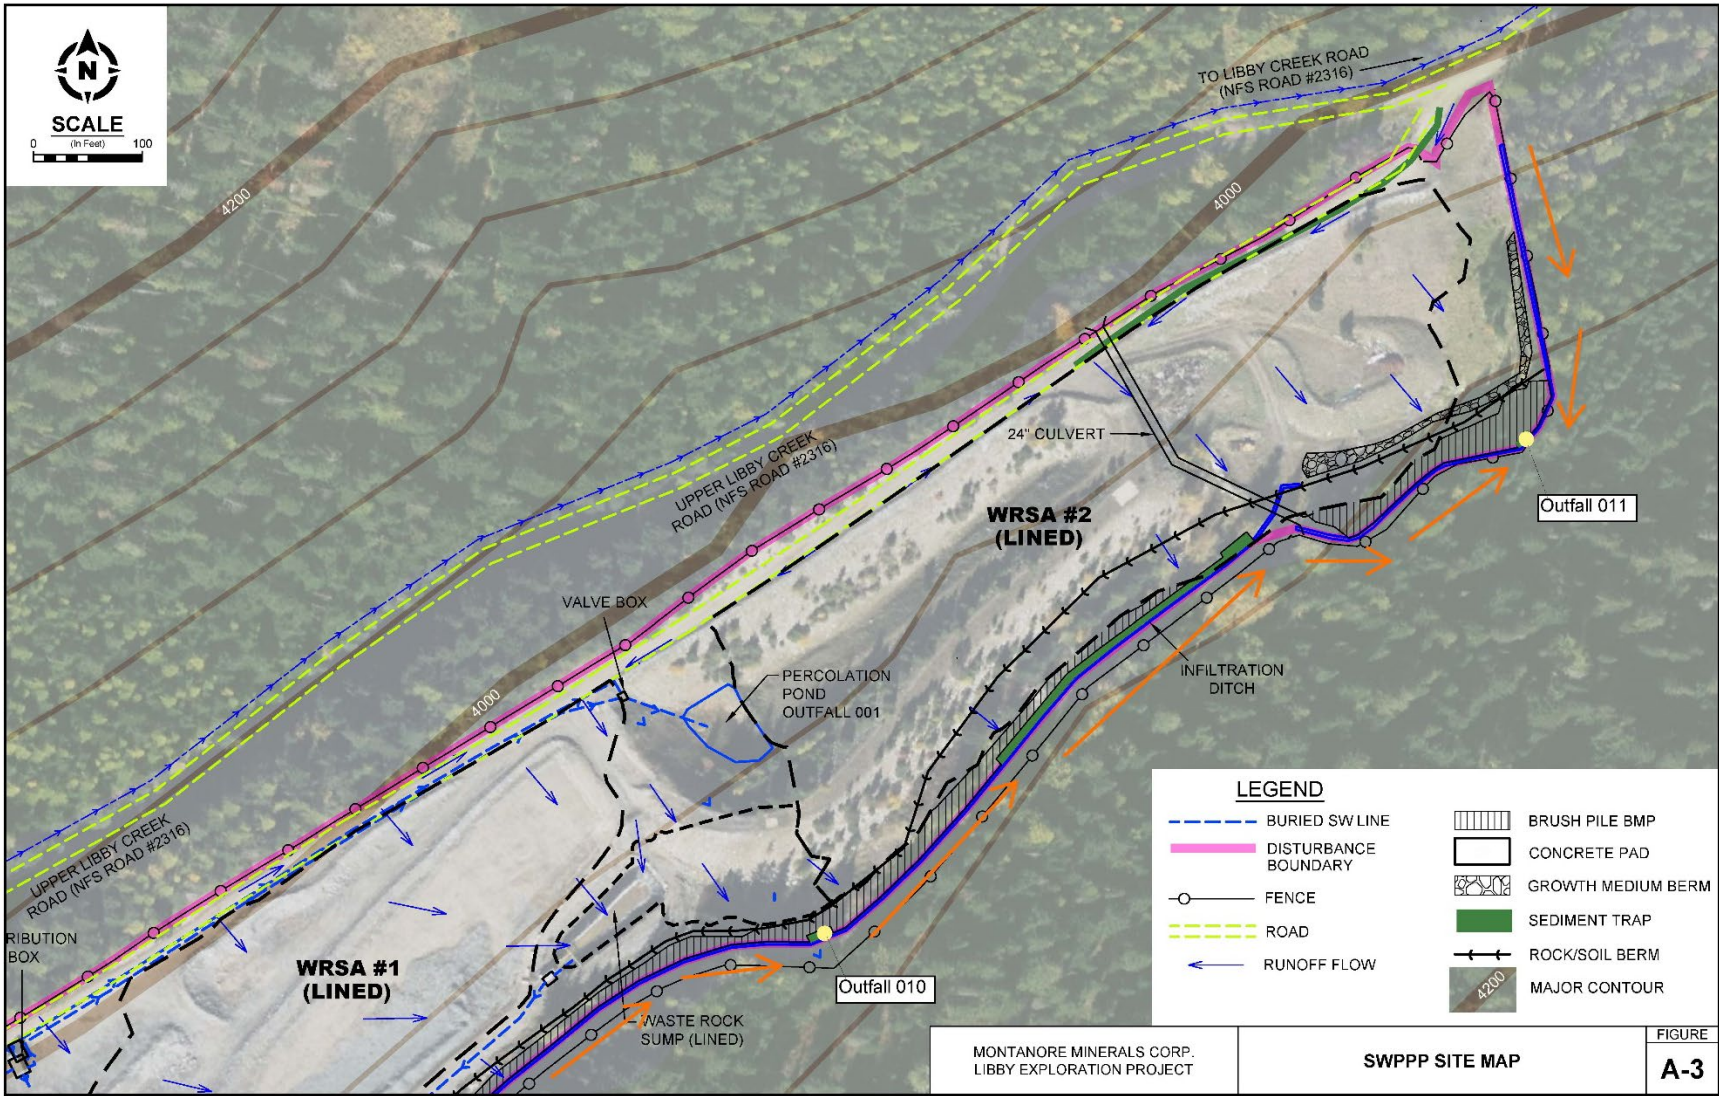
Site Maps of Storm Water Outfalls and BMPs
